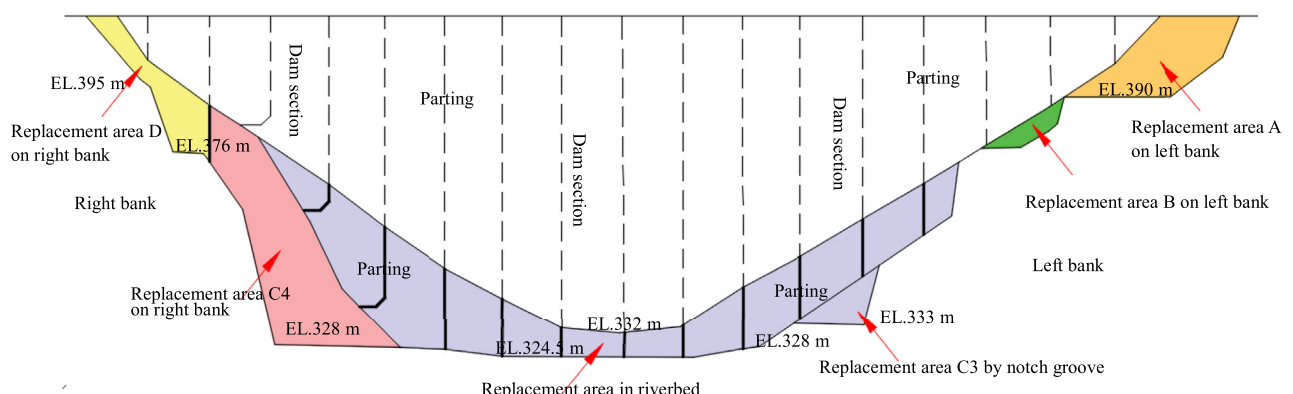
Joints of foundation replacement area in riverbed dam section.
